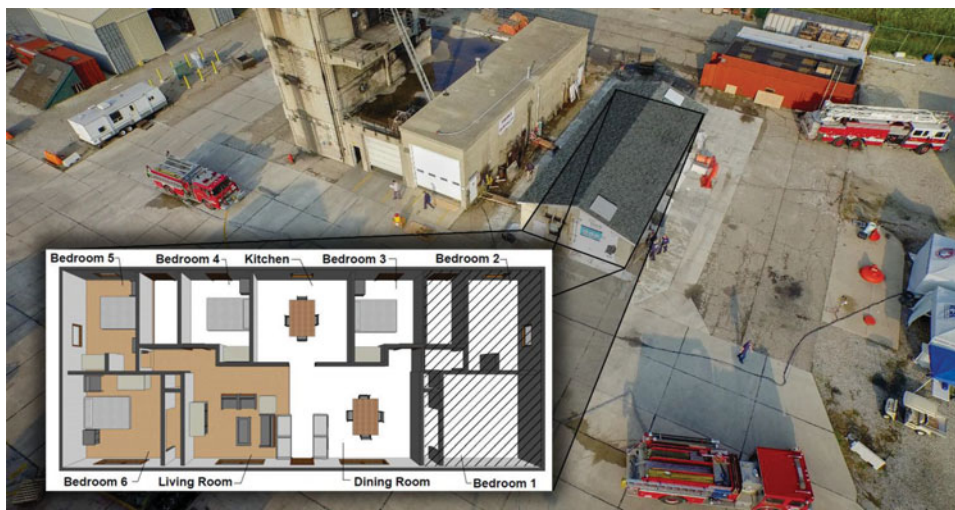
Floor plan of the structure. Fires were set in bedrooms 1 and 2 or bedrooms 5 and 6.
